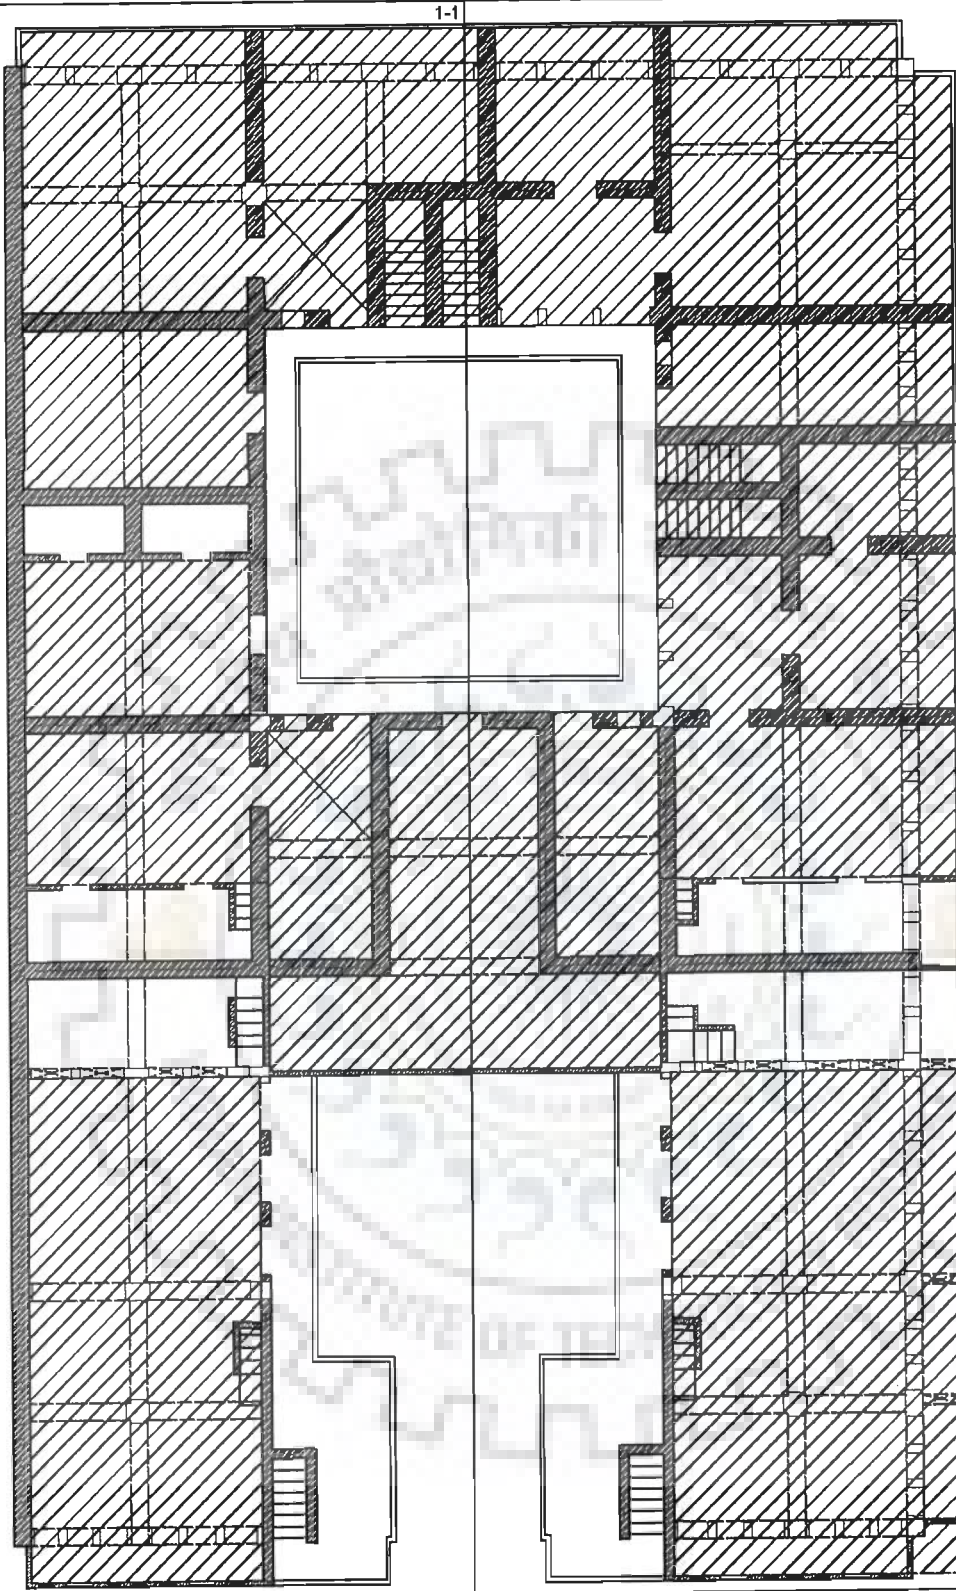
Mezzanine Floor Plan for Upper Ground Level
